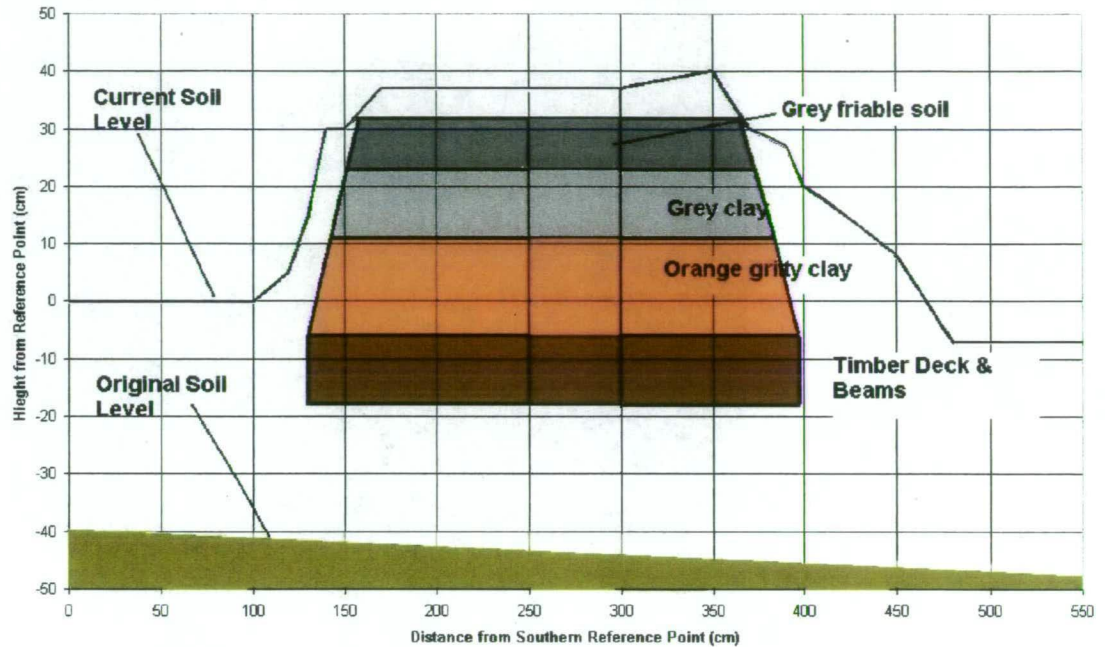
Possible Arrangement of Culvert as Constructed
